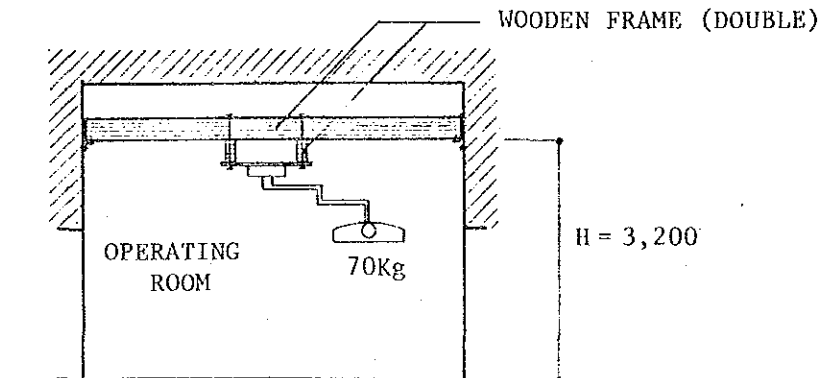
OPERATING LIGHT INSTALLATION PLAN
